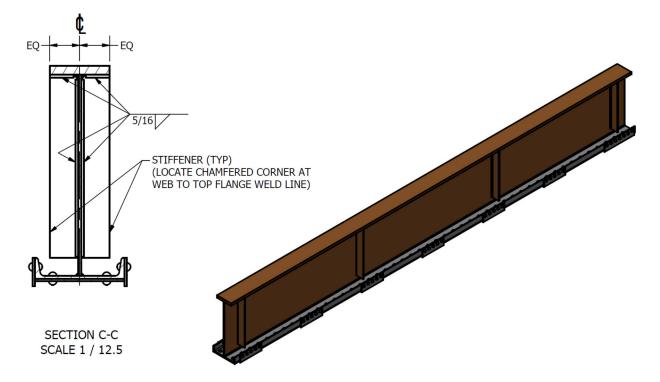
Illustration of girder specimen for fatigue testing with bottom flange utilizing half section truss chord from the Winona bridge that contains real pack-out corrosion.
